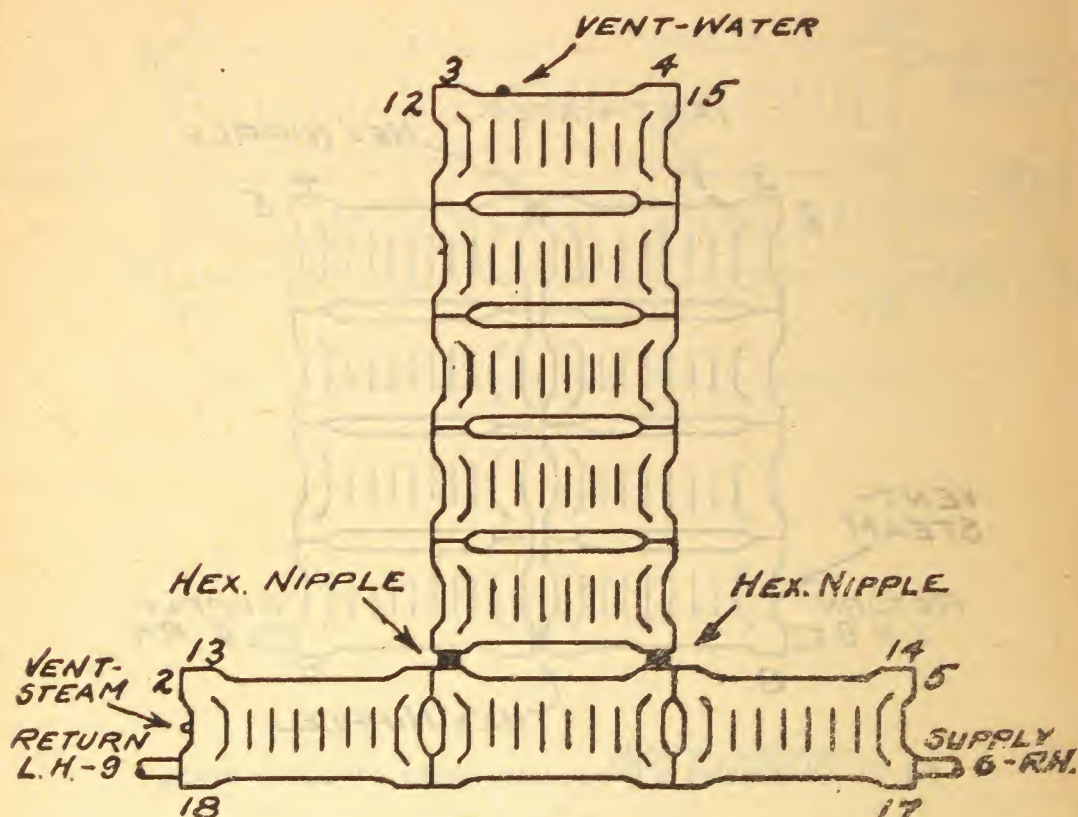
Assembled in single tier and single stack. Water or one or two pipe steam.
